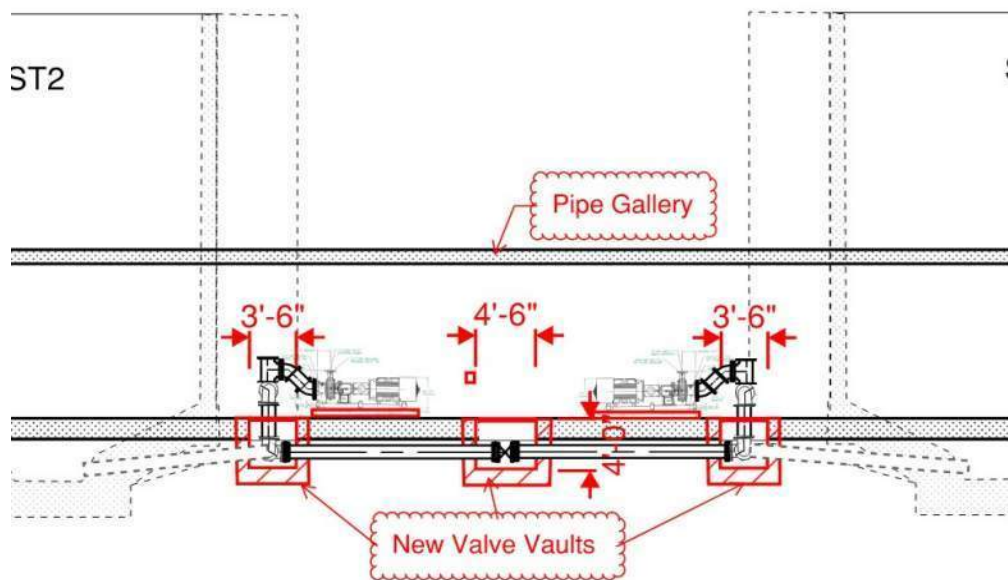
Alt-2A SSTs 1-4 Pipe Gallery Proposed Layout – Section View
